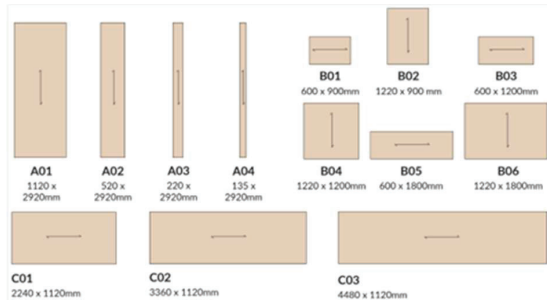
CLT panels KIT made of 13 structural elements organized into walls (from A01 to A04), lintel (from B01 to B06) and floor (C01, C02 and C03).
